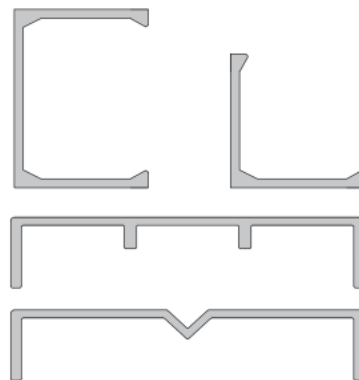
Typical extruded open cross-sections with bulbs and stiffeners (adopted from (Tindall, 2008)).
